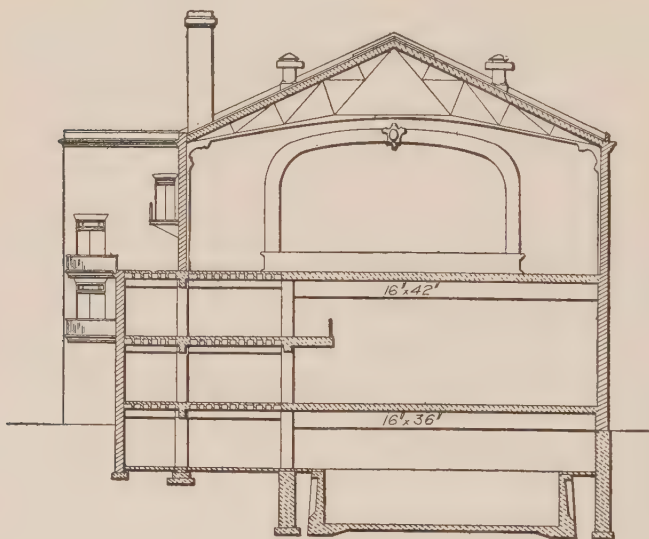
CROSS SECTION THROUGH AUDITORIUM AND GYMNASIUM.
